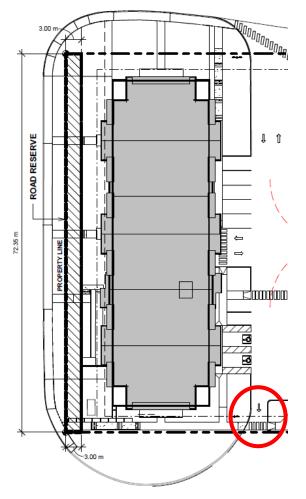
Frontage detail showing road reserve for future Ryan Road expansion (grey hatching outlined in black) and exit-only to Sandwick Road intersection (shown in red).
